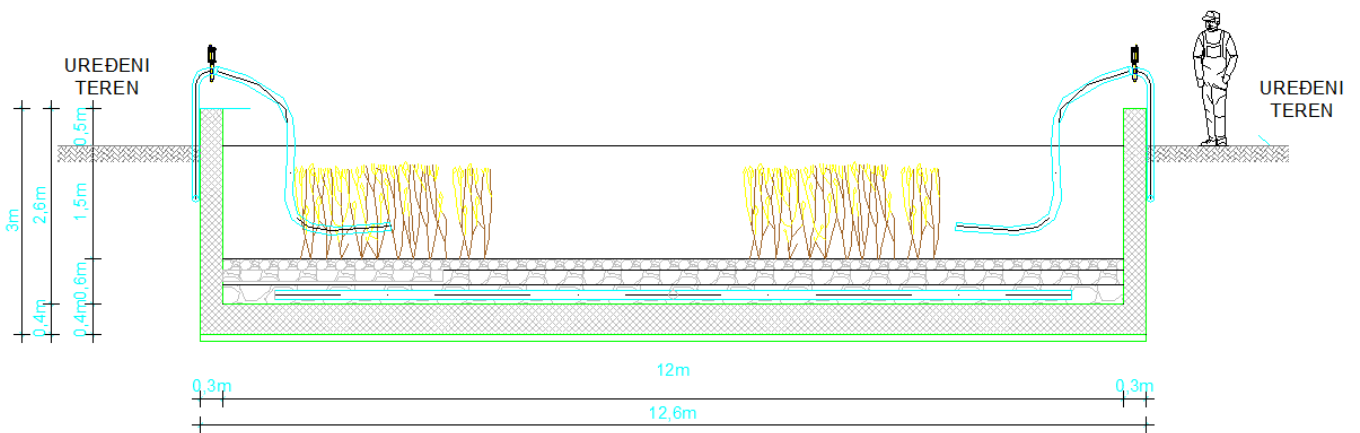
Cross section of RB in Kastelir (Detailed design, 2016)²⁷
